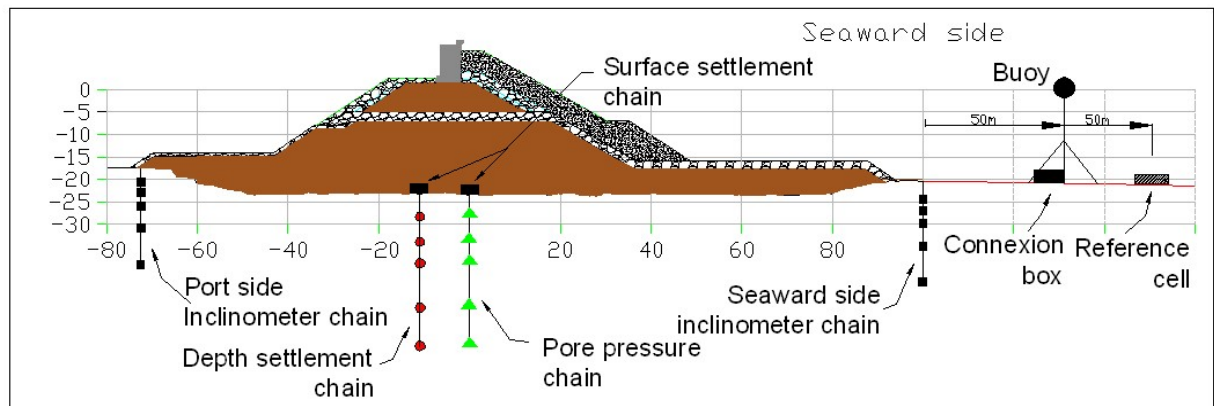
Typical cross section for rubble mound breakwater instrumentation.
